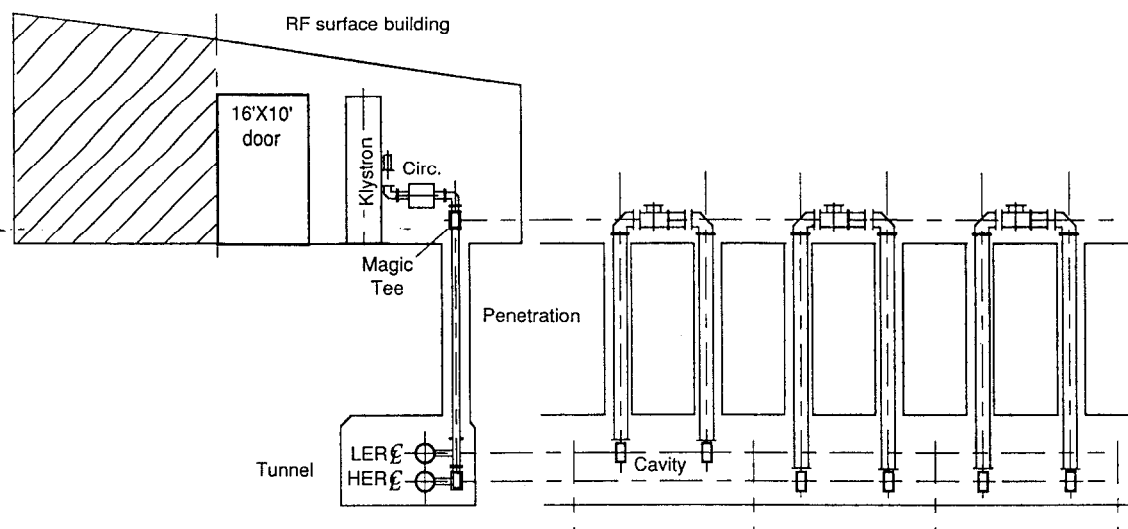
Cross-sectional view showing an RF station and a section of the PEP tunnel.
